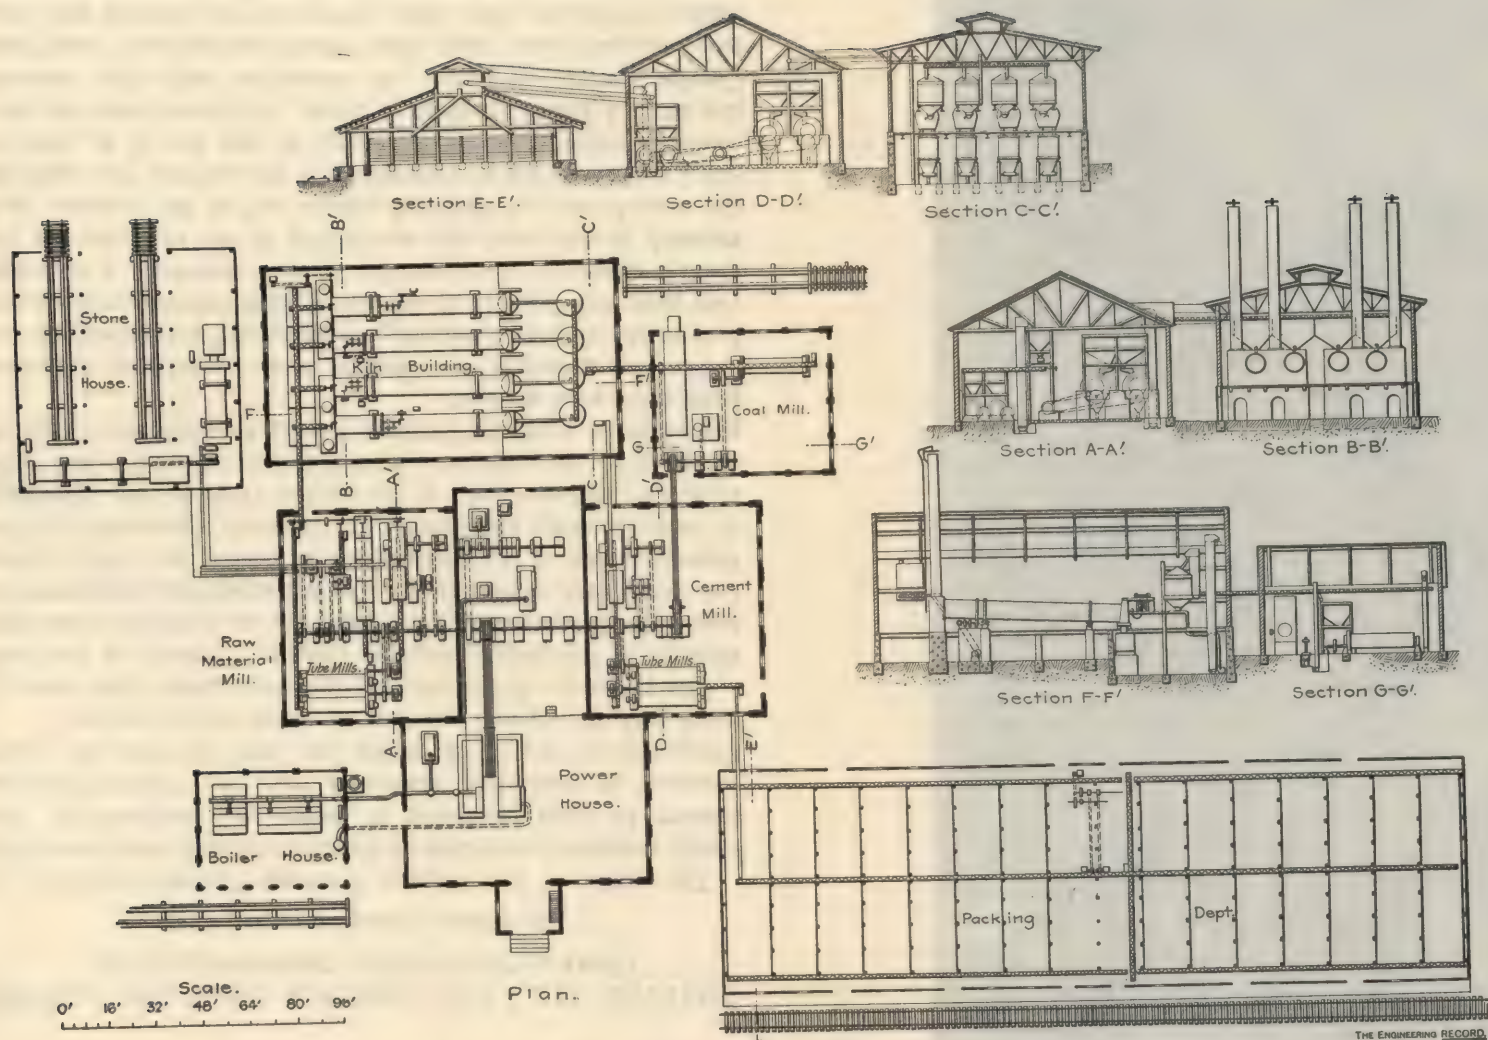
Plan and Sections of the Buildings, Virginia Portland Cement Company, Craigsville, Va.
